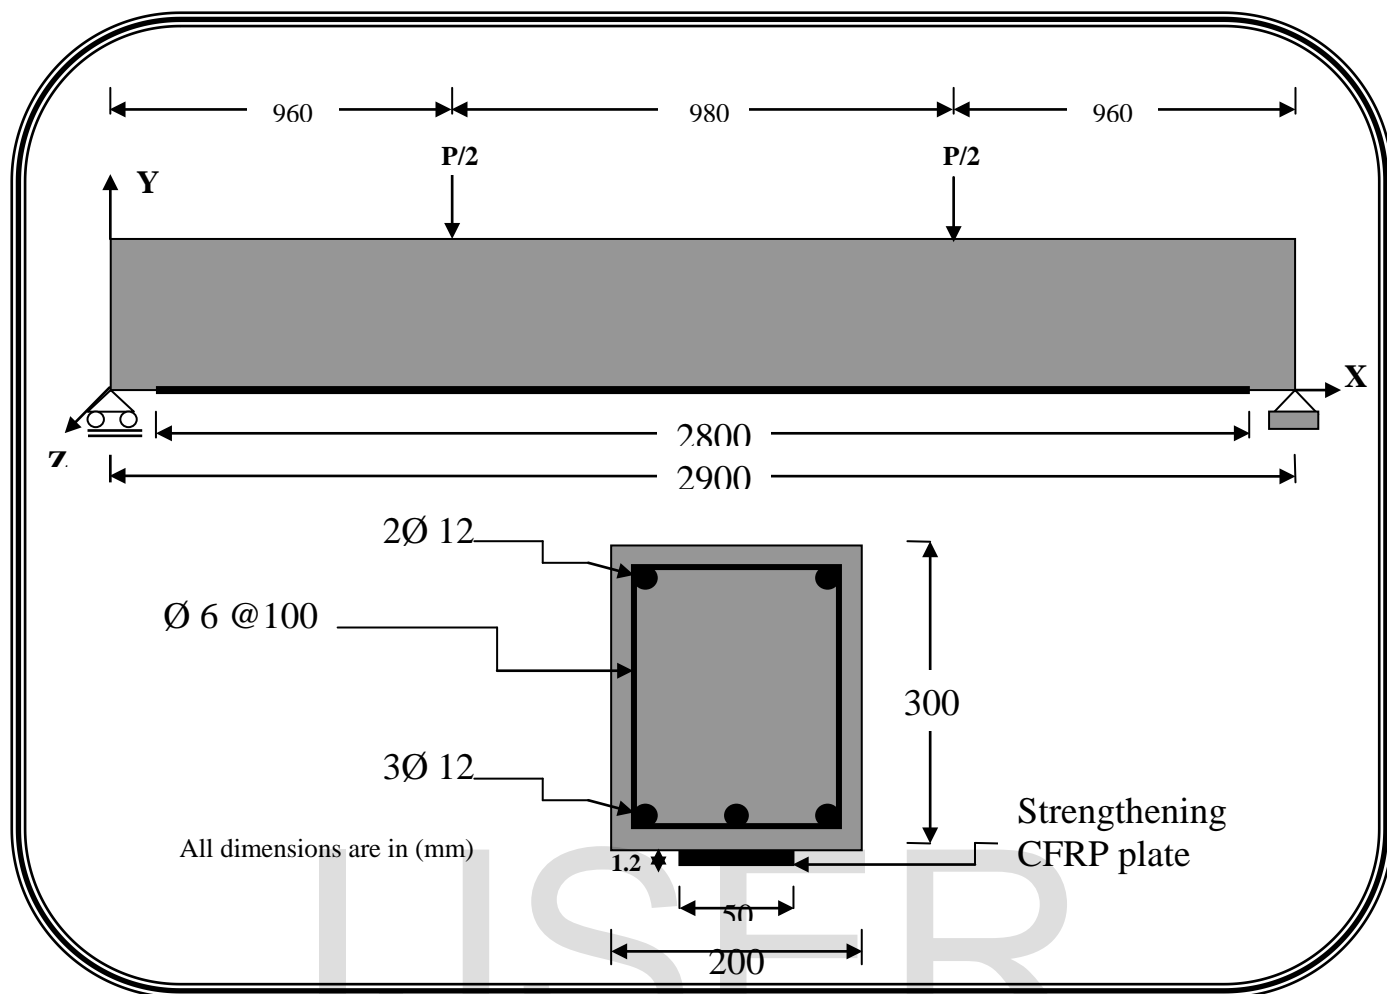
Details of Zarnic et al. CFRP plated beam.
